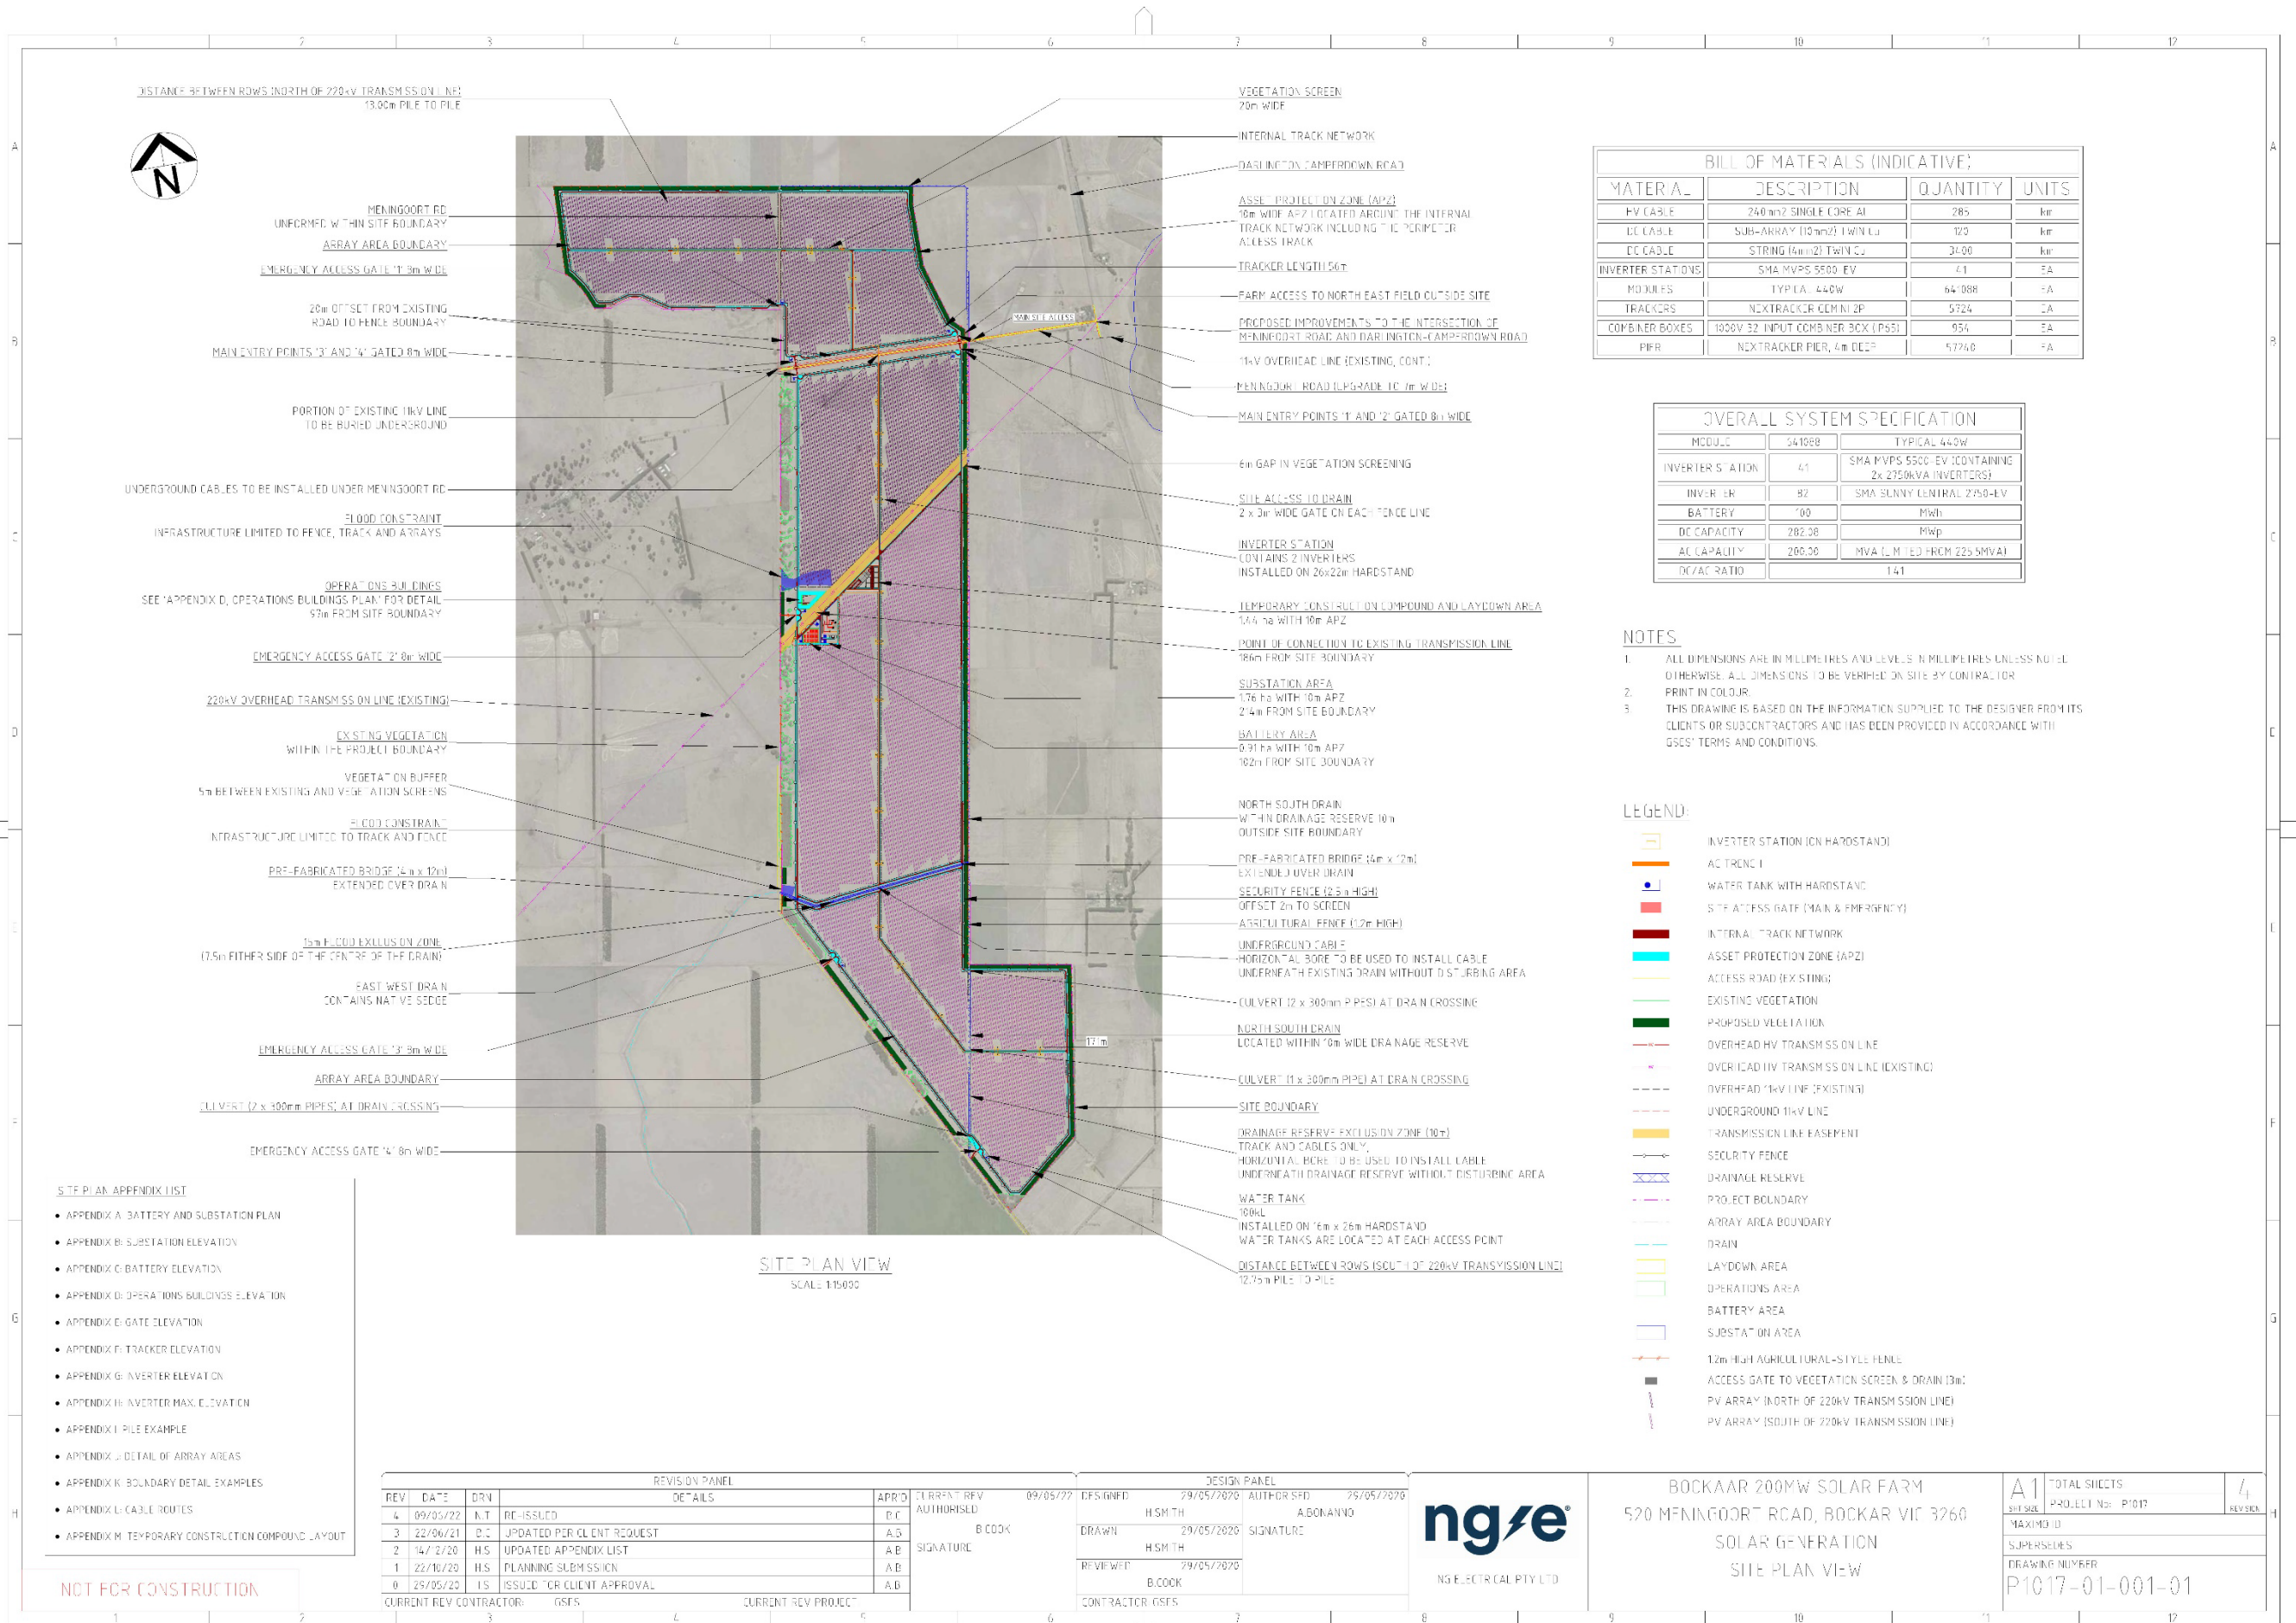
Proposed Bookaar Solar Energy Facility – Site plan (See the ‘Site Plan’ that accompanies the planning application for a scaled version)
